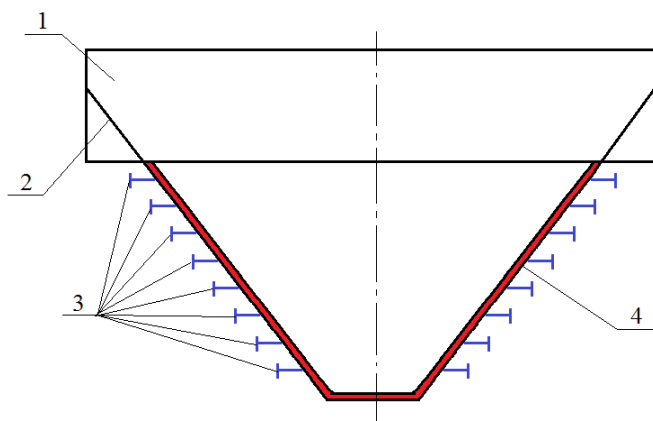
Reinforcing frame of a steel bunker at Kryvorizhstal: 1 – bunker beam; 2 – bunker wall; 3 – bunker ribs; 4 – supporting bent frame.
